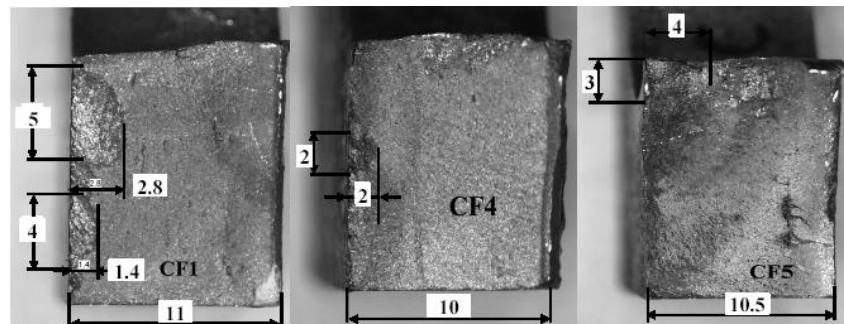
Initial crack-like flaws observed in some tested riveted specimens from the Pinhão bridge [15].
